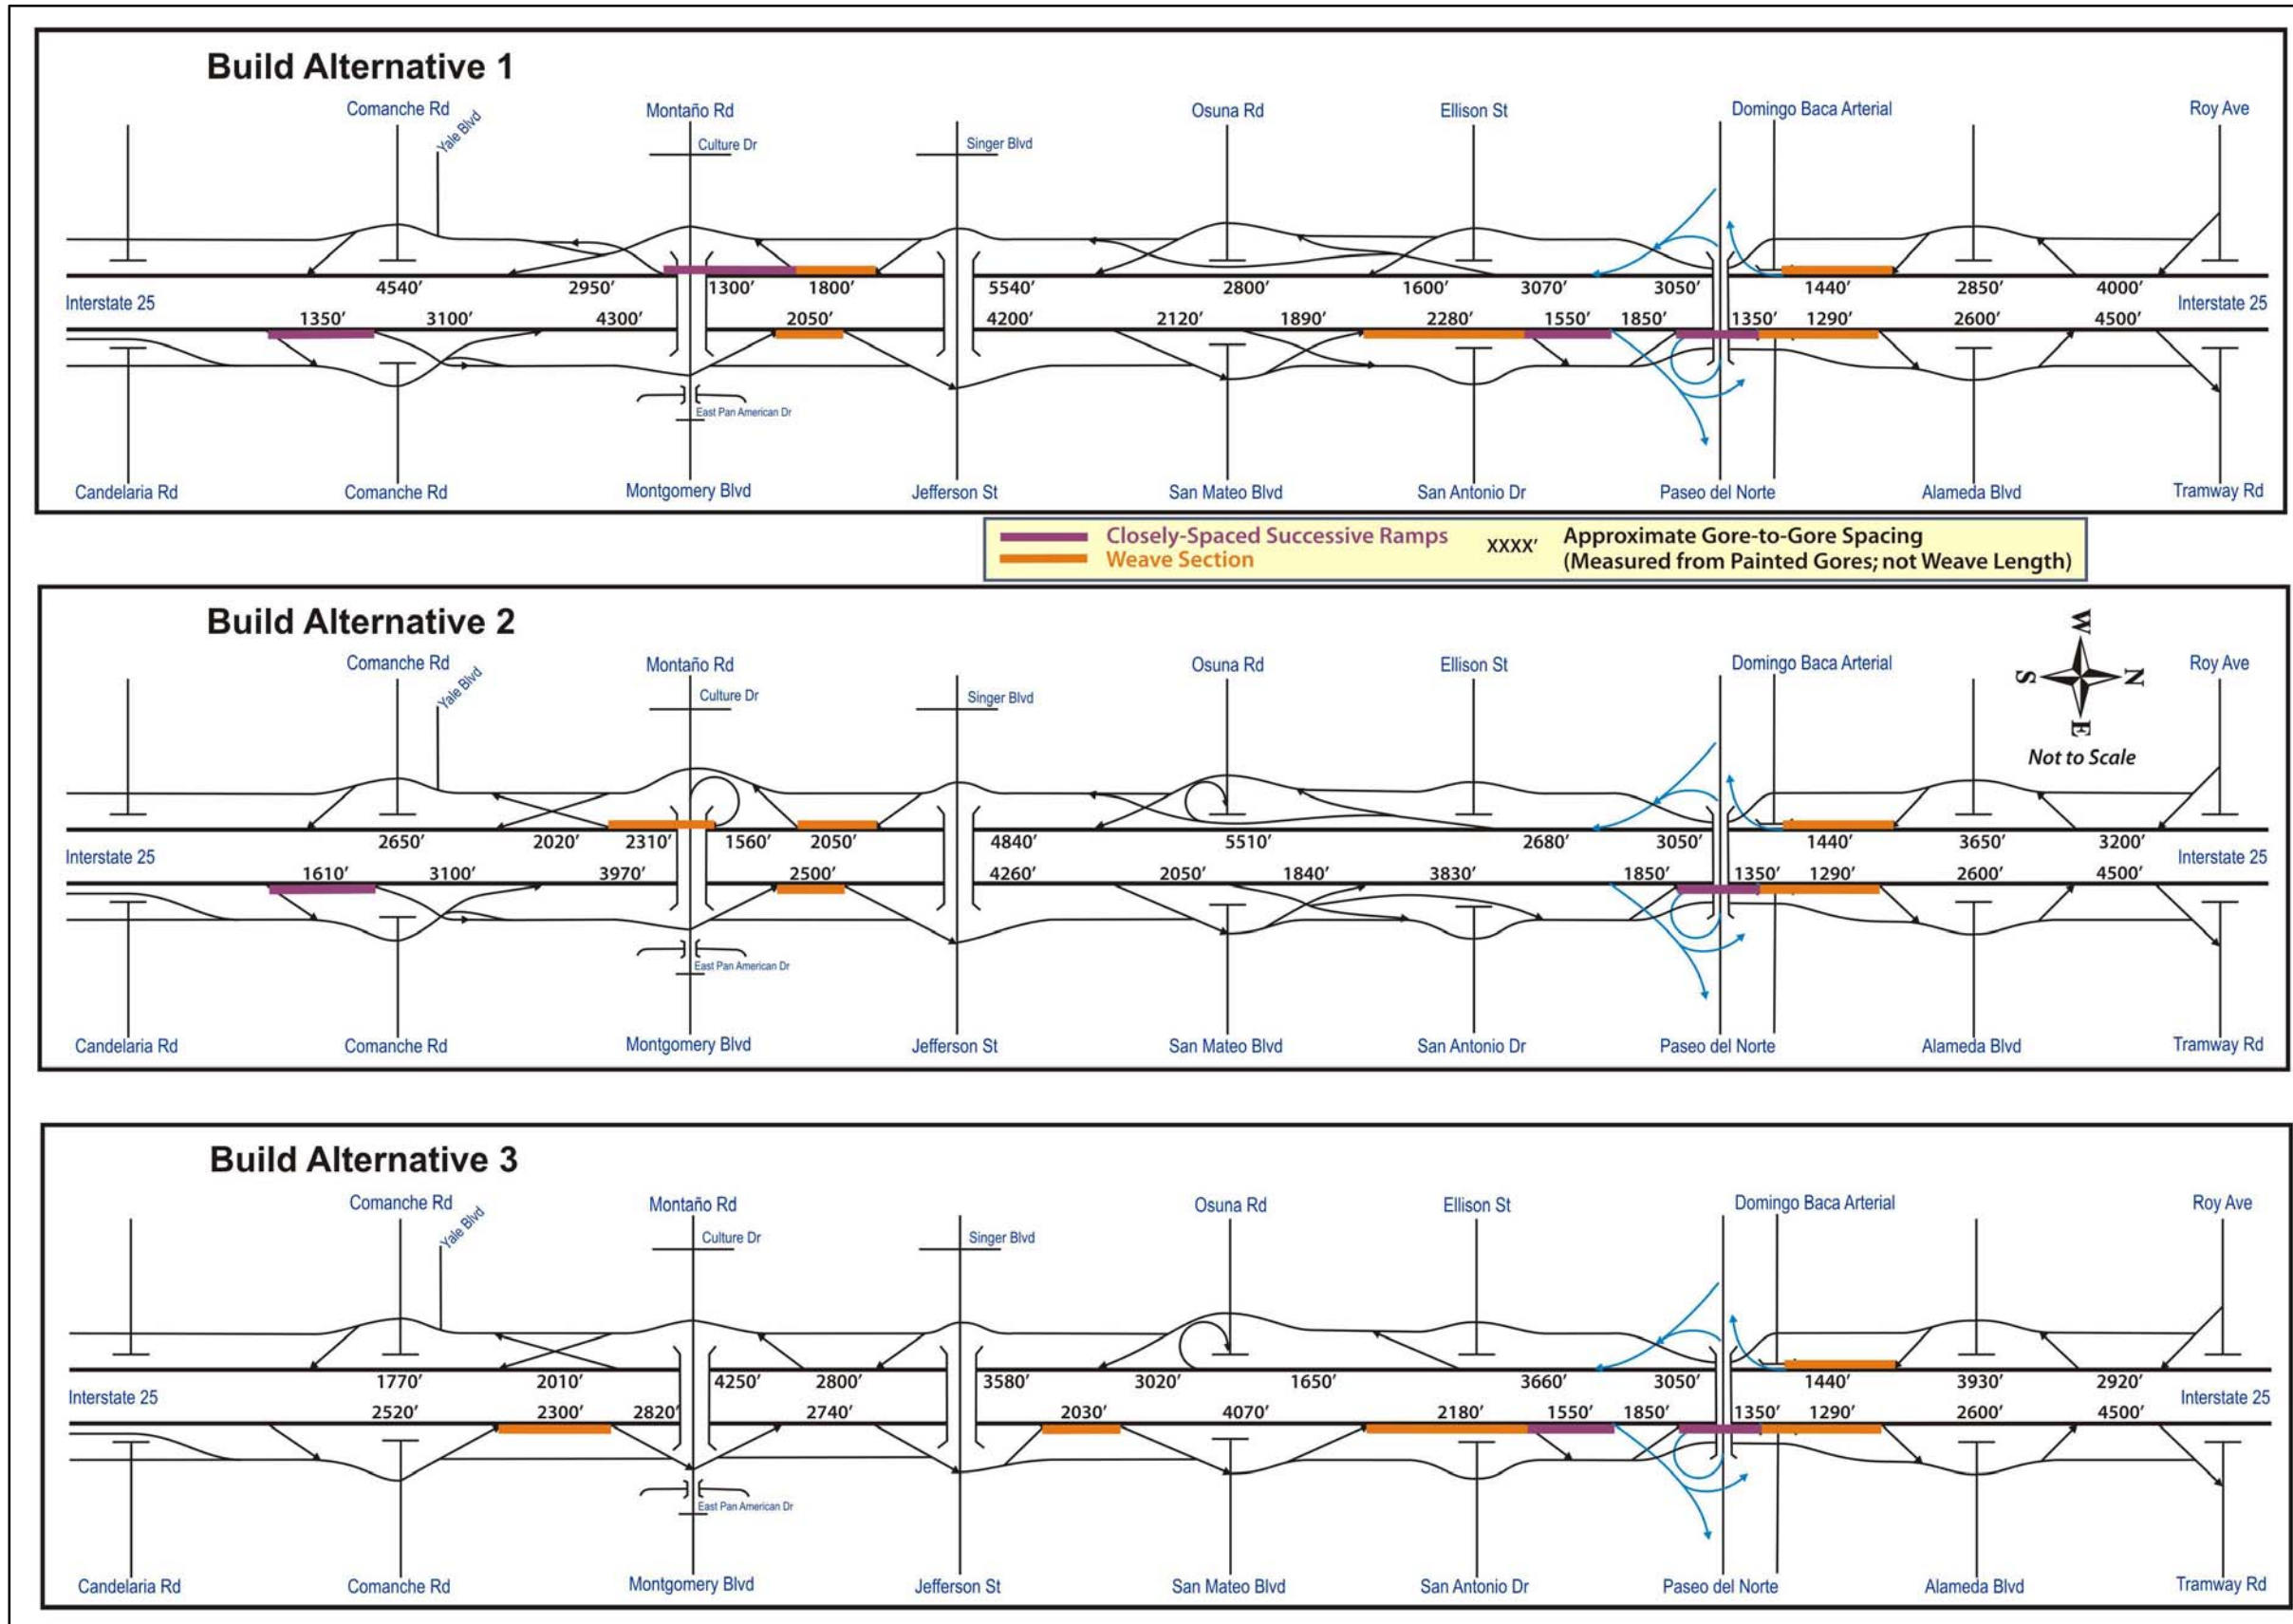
, Ramp Spacing Schematic for the Build Alternatives
